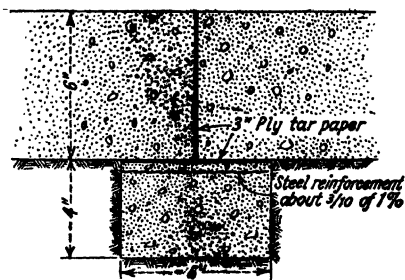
Showing Reinforced Concrete Seat at Block Joint.
